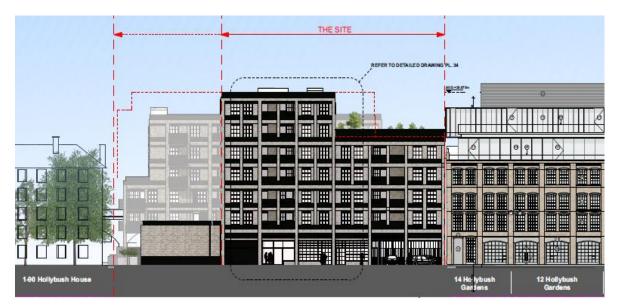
Proposed Building A west elevation from Hollybush Gardens
